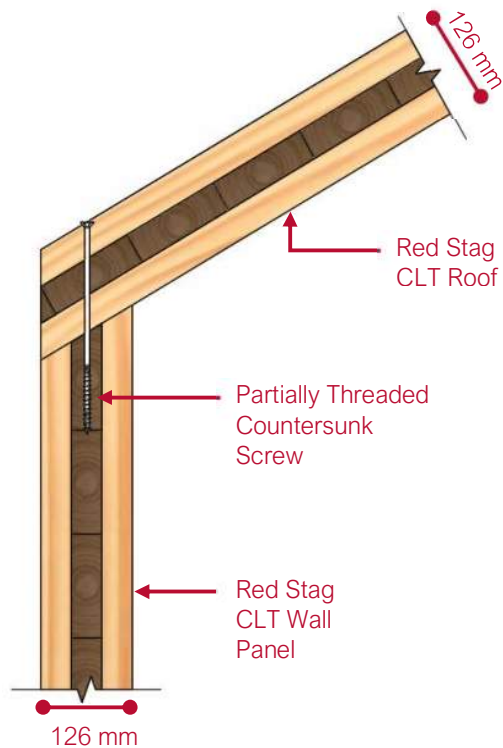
Red Stag three (3) layer CLT roof panel to CLT wall panel connection.
